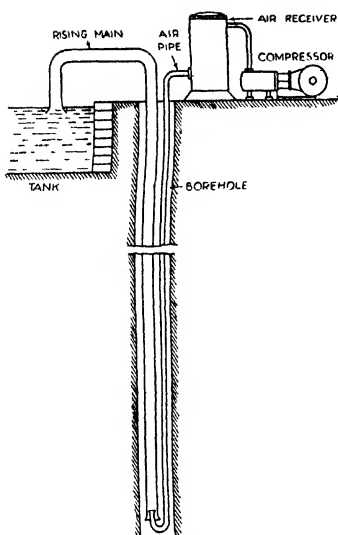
ARRANGEMENT OF COMPRESSED-AIR PUMPING PLANT
